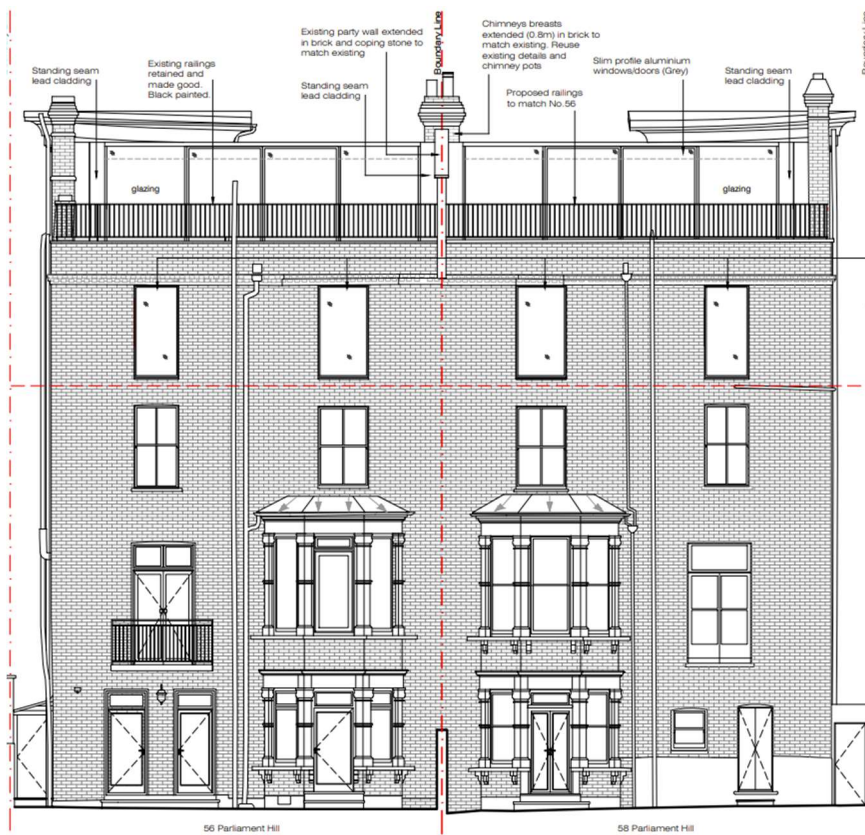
Proposed Rear elevation from previous refusal scheme (2024/2695/P)
